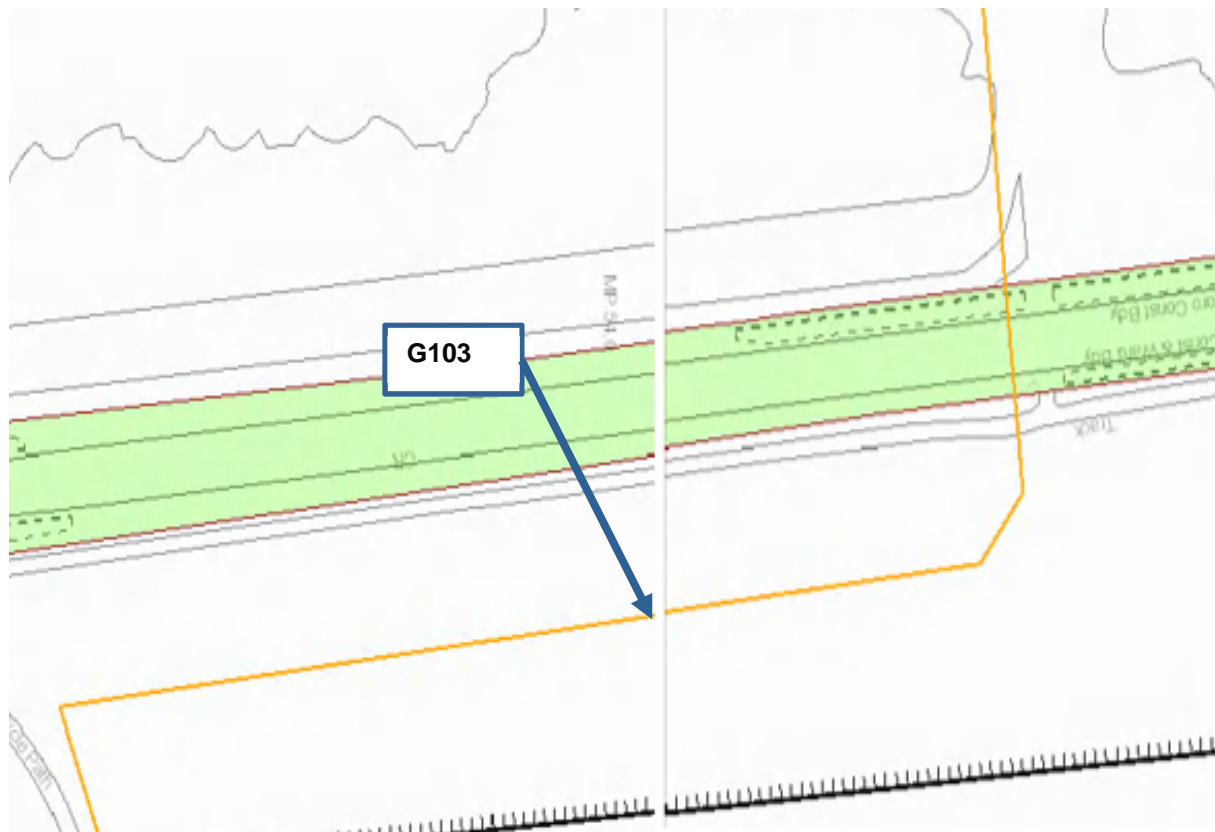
Gas Utility between BGK-1544c Nine Wells Bridge and BGK-1544b Addenbrooke's Bridge
